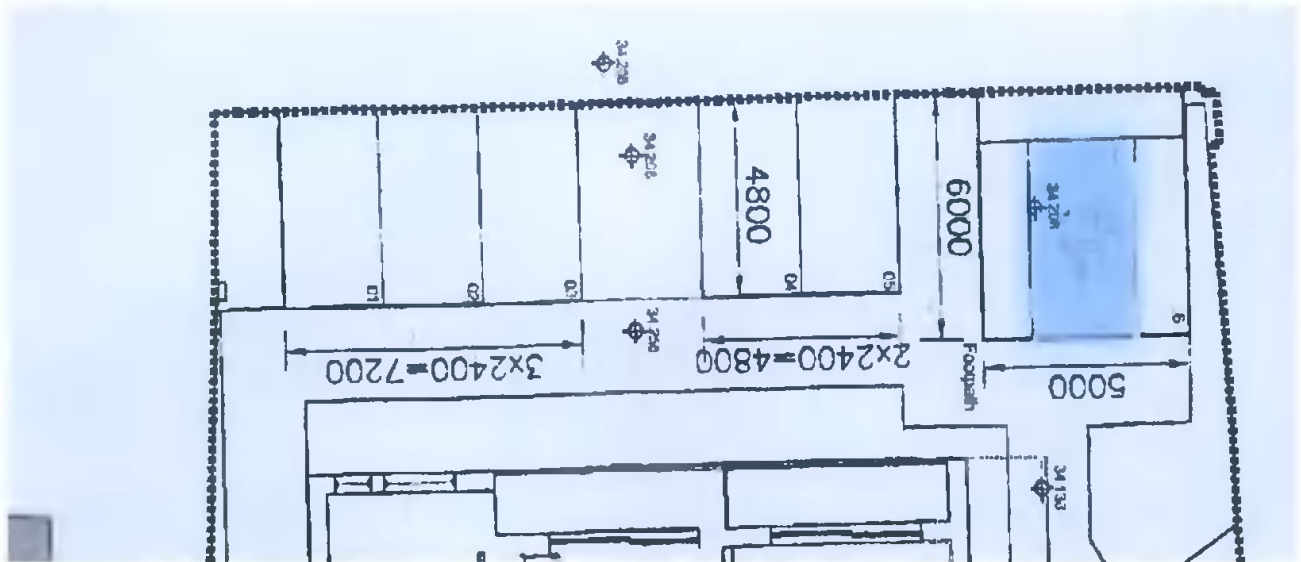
Extract from Access and Parking layout showing 6 parking spaces on Ardeevin Drive
